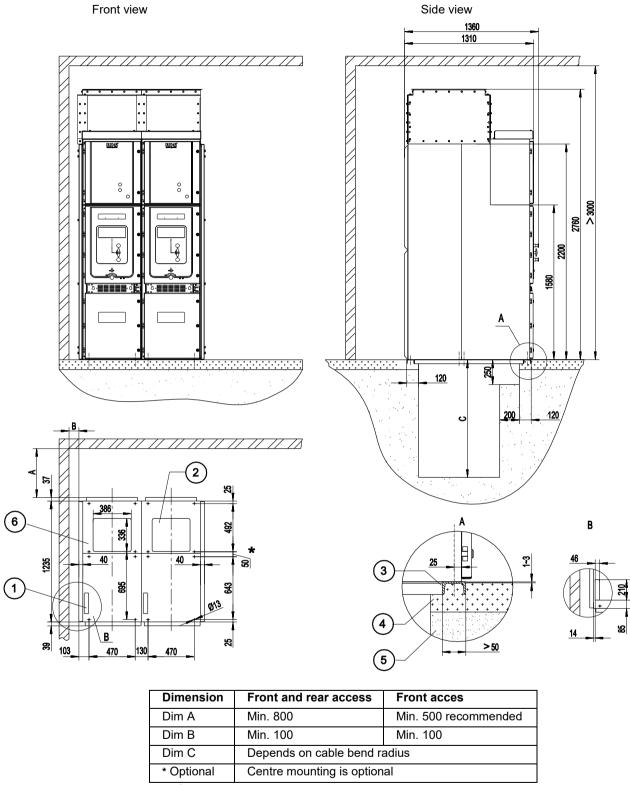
Floor plan for Power Xpert® UX switchgear (example)
